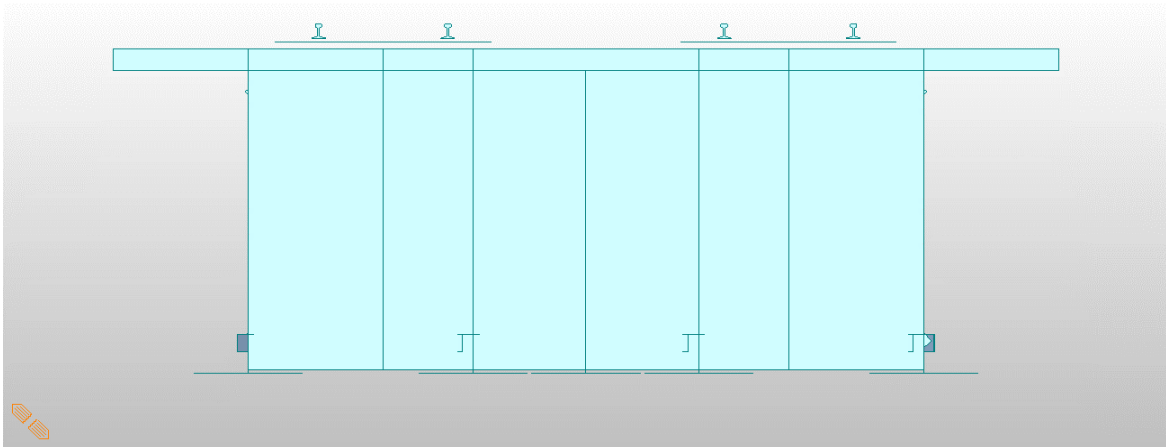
Cross Section of Steel Composite Girder with Precasted Slab track
